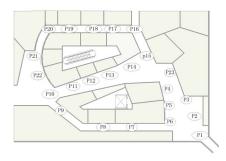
The floor plan used in Case Study, a single floor in a shopping center.
